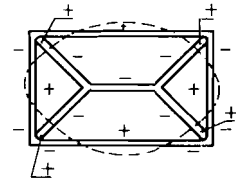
Flat grid of fracture lines on the horizontal projection of a shell.
